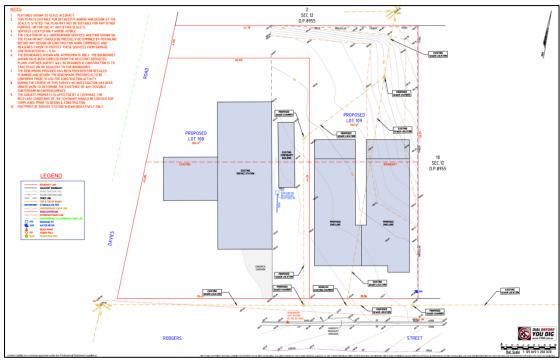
Plan of Proposed Subdivision (source: de Witt Consulting)
